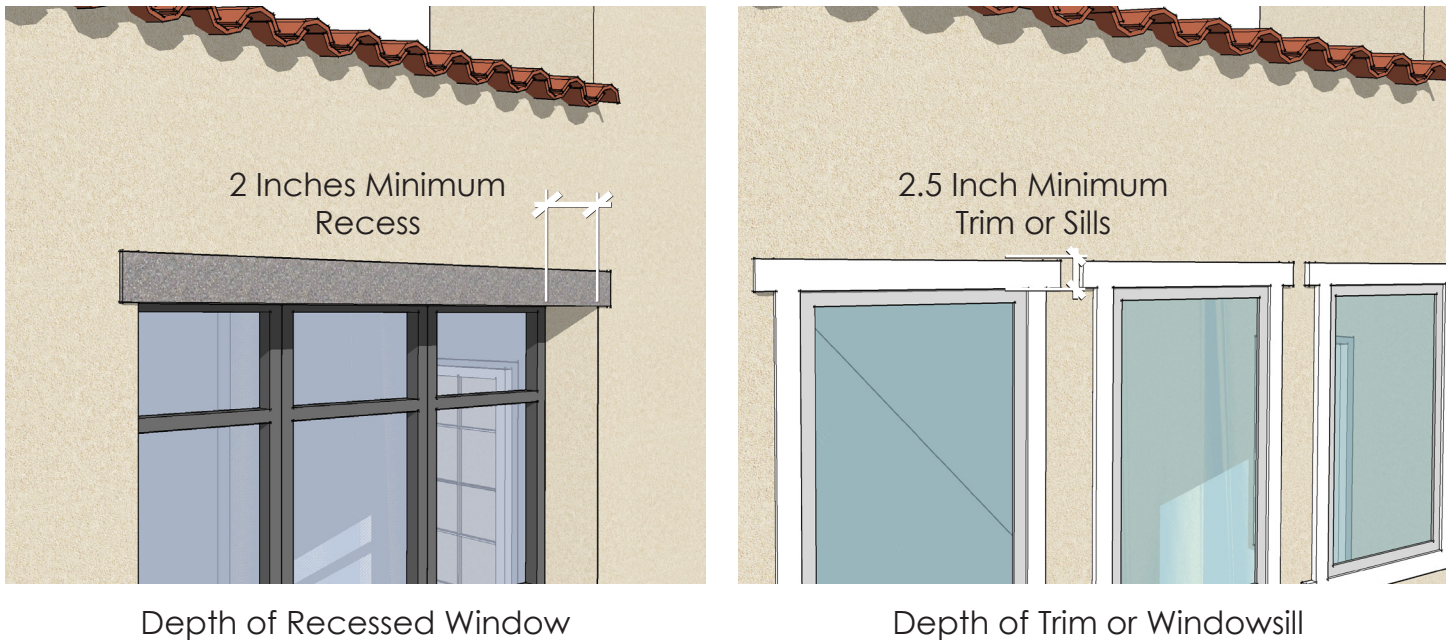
Windows shall either be recessed from the wall plane (left) or shall have a surrounding trim or windowsill (right) (3.C.2)
